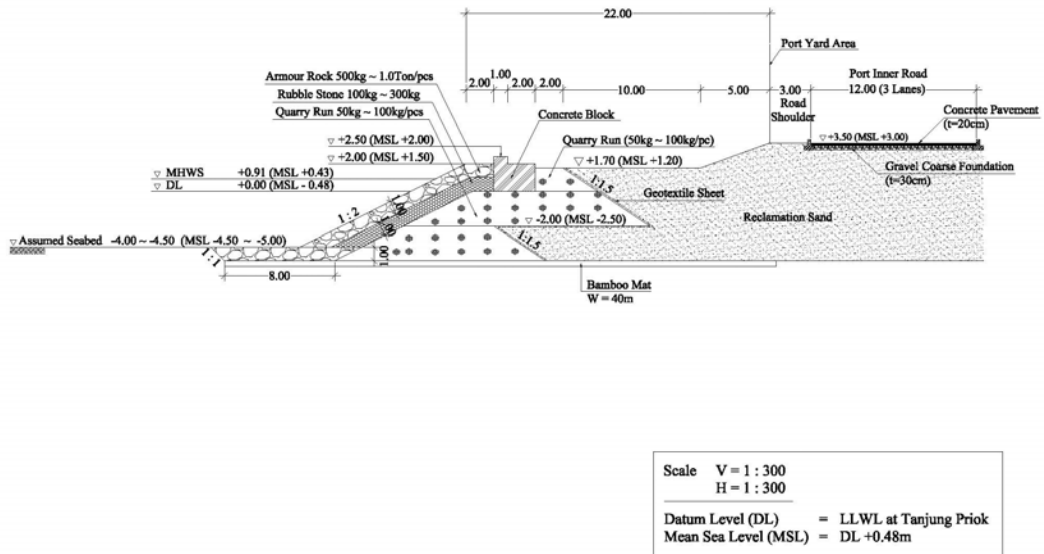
Typical Cross Section of Revetment of West side at North Kalibaru
